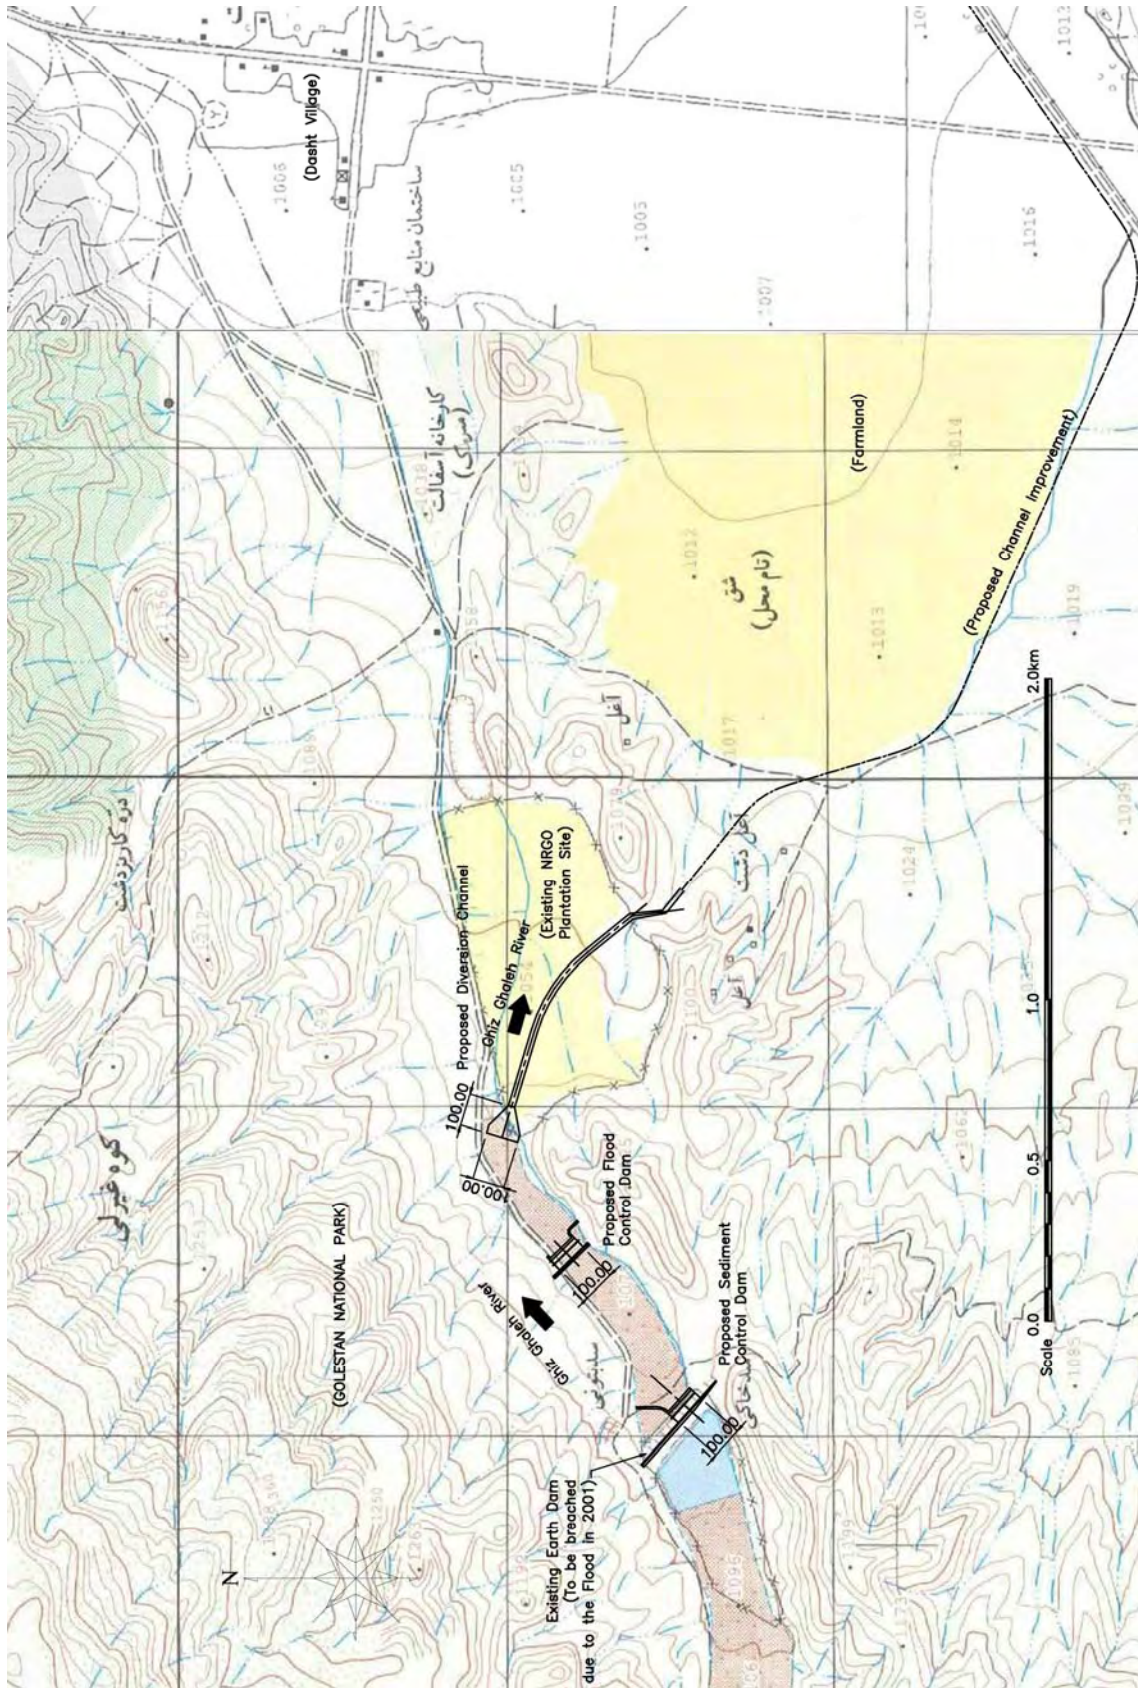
Layout of Structures/Facilities Proposed in River Restoration Plan
